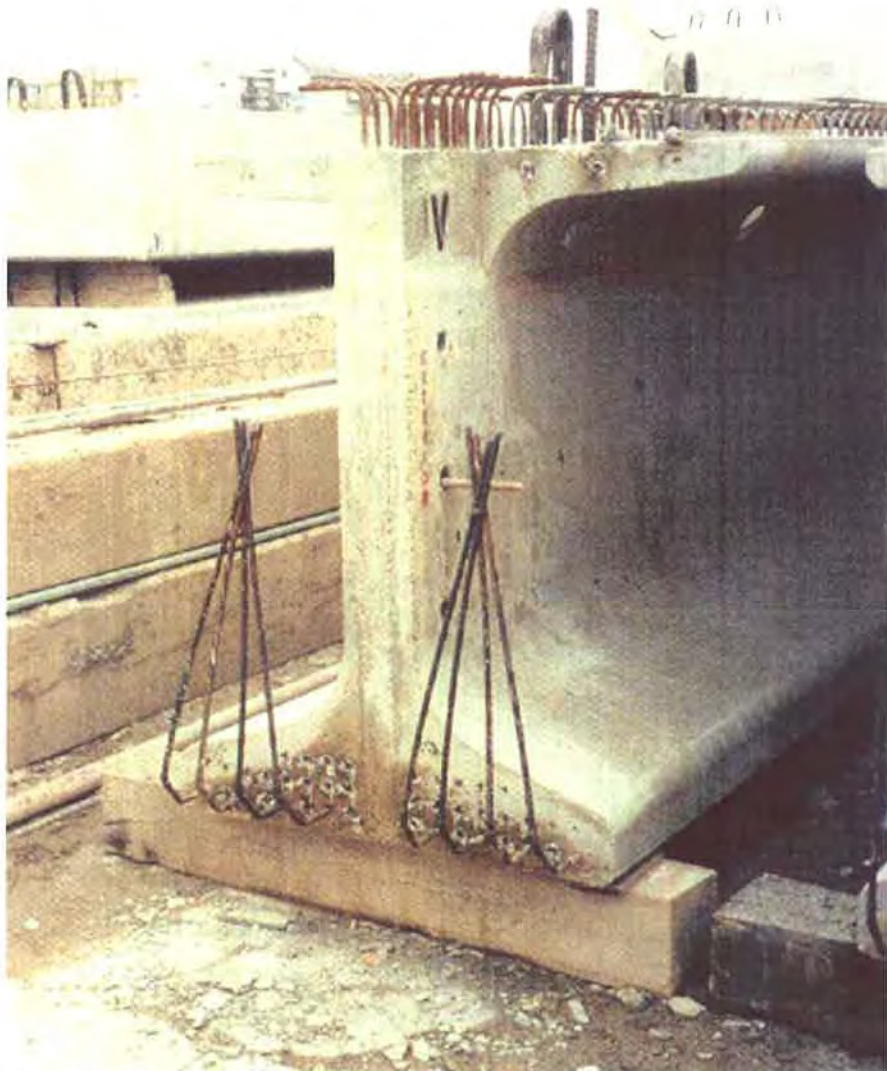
Extended Bent Prestressing Tendons at the end of a Prestressed Concrete Girder (Noppakunwijai et al. 2002)
